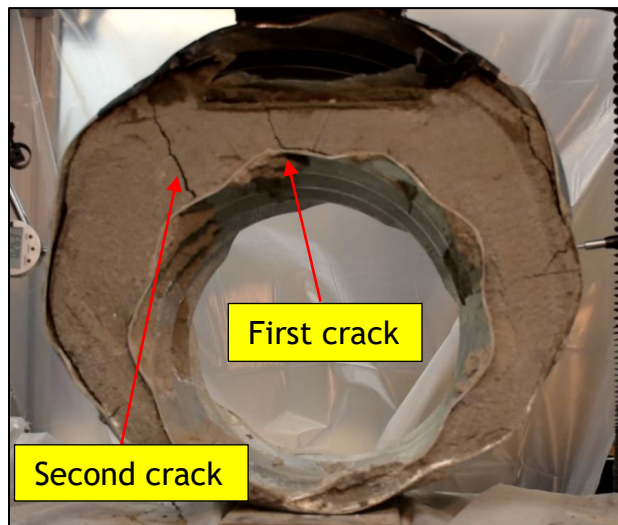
Cracks in a Sliplined Culvert with Voids at the Crown.
